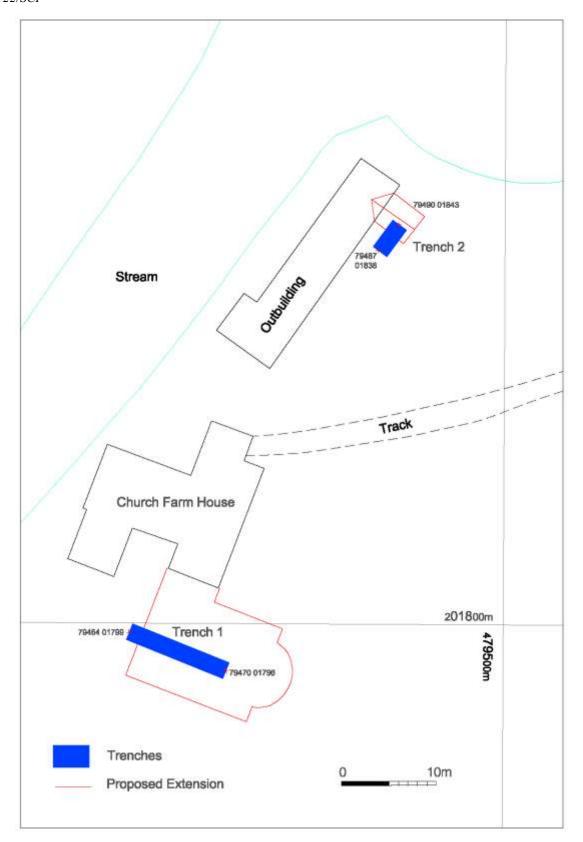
Site Plan showing Trench Locations and Proposed Development (Scale 1:400)
